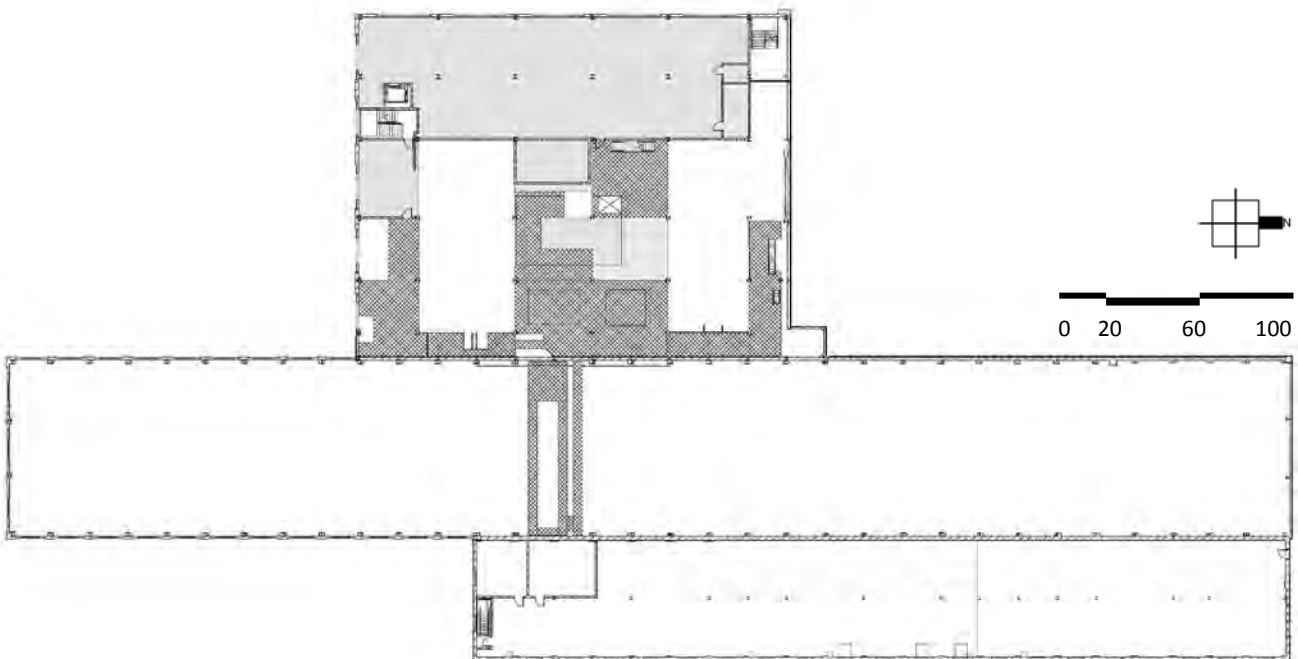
Third Floor Plan. Alley Poyner Macchietto Architecture, 2014.
